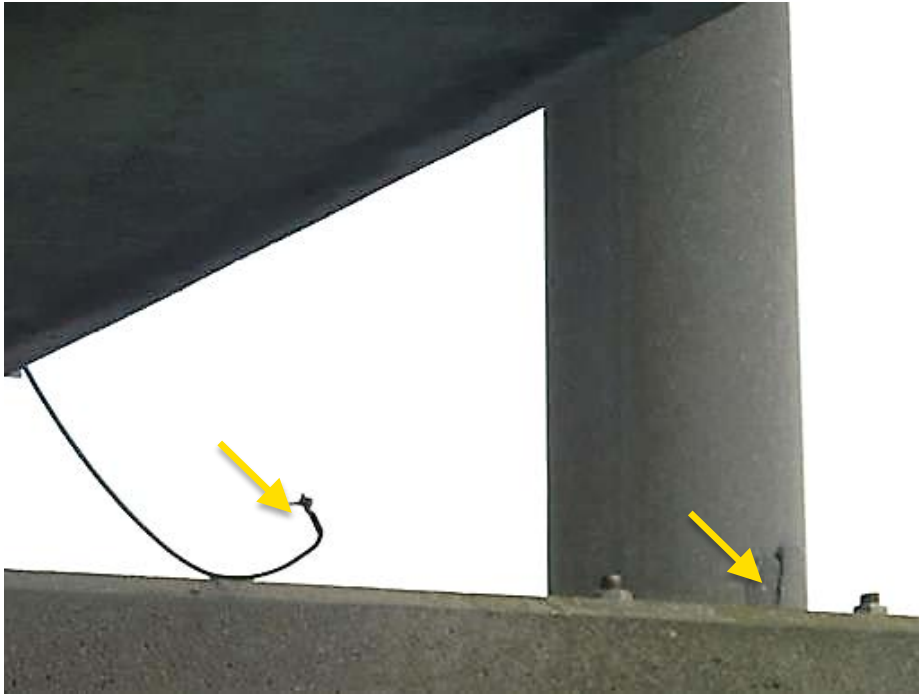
CSB123 Light Pole – Delamination Near Baseplate and Disconnected Cable (Looking Southwest)
